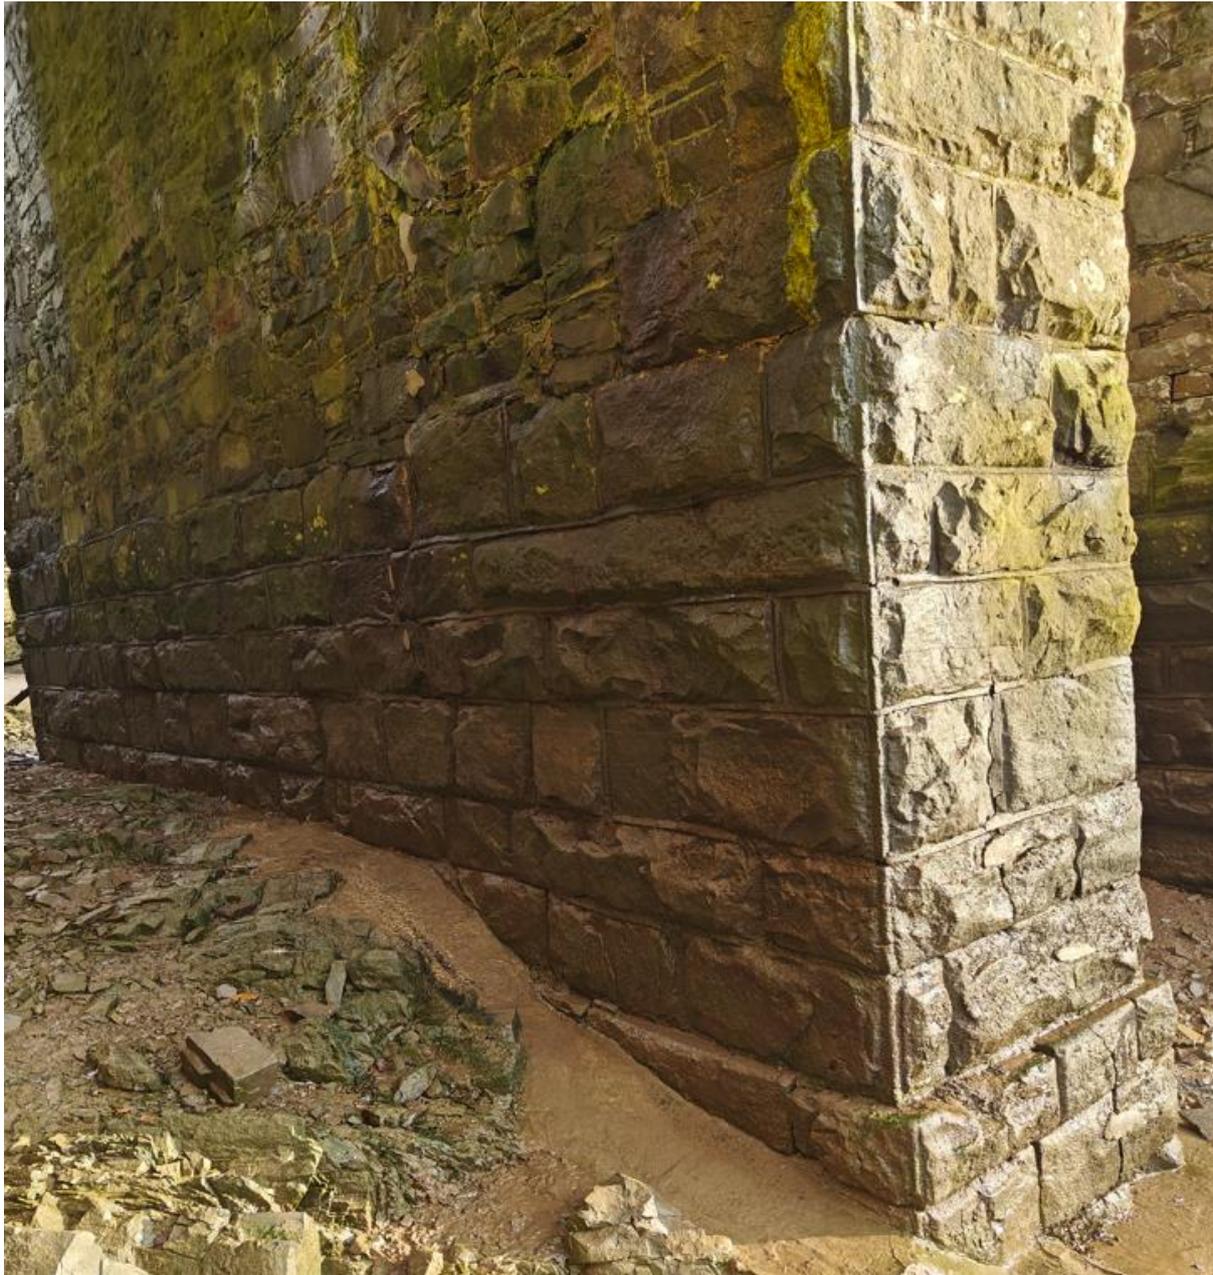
Photo showing layout of existing ashlar Stone masonry Intermediate (North) Pier
